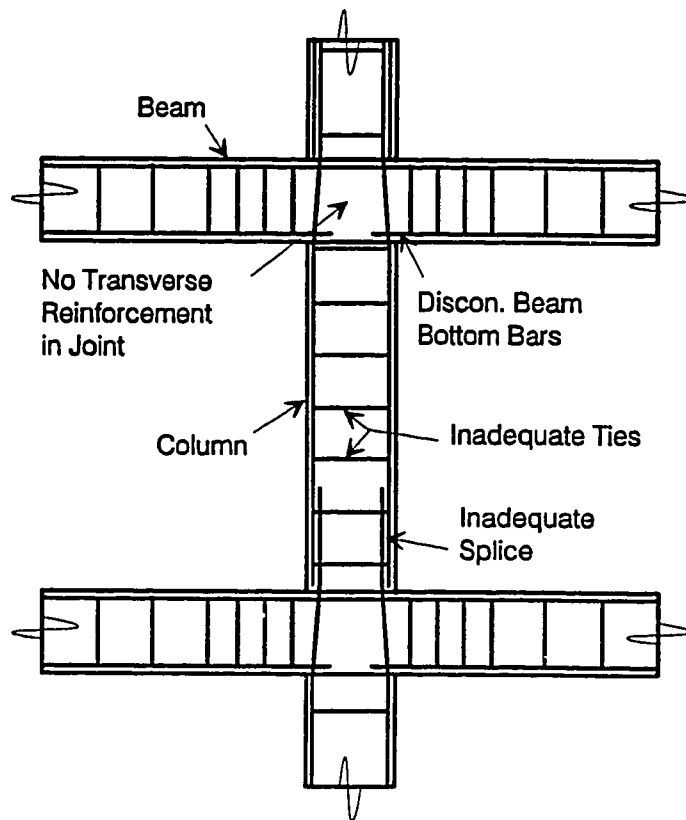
Elevation View of a Non-Ductile R/C Frame Between Two Floors
